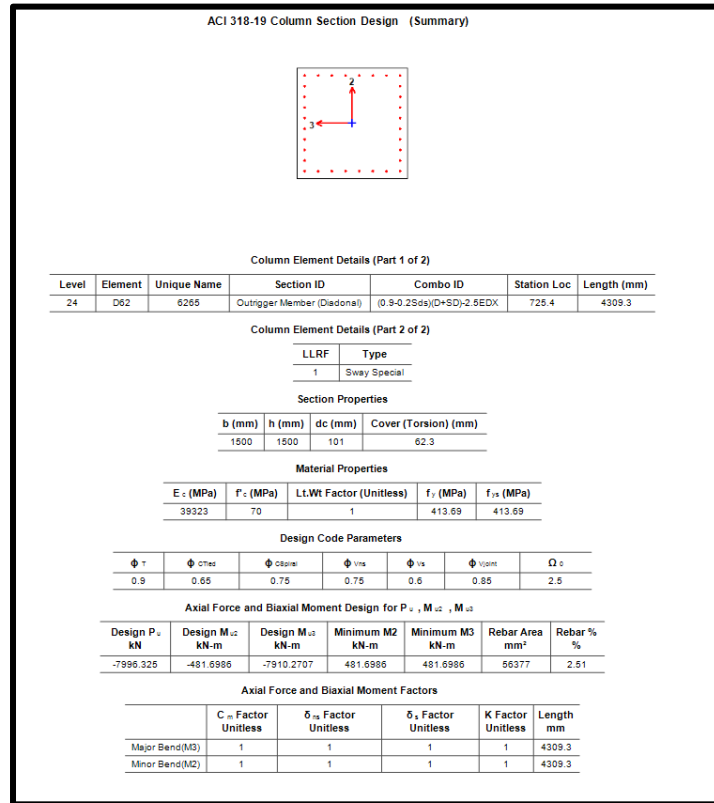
Reinforcement of Outrigger Diagonal Member
